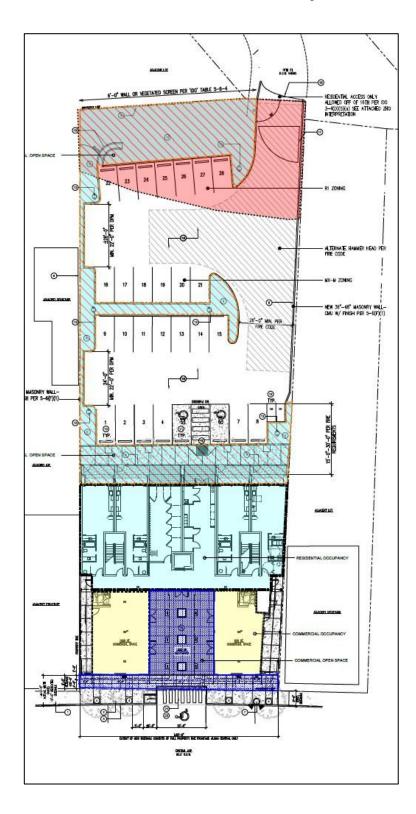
The building location shown to be more than 50 feet from R1-A zoned lots.
